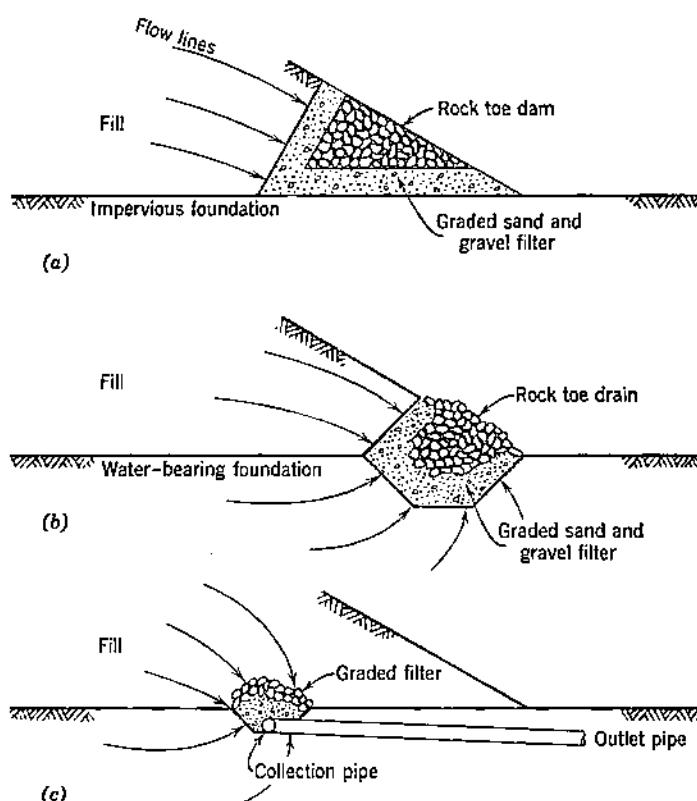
Three types of toe drains: (a) simple rock-fill toe, (b) deep rock toe designed to drain both the fill and the water-bearing foundation, and (c) pipe-type drain with collection pipe.
